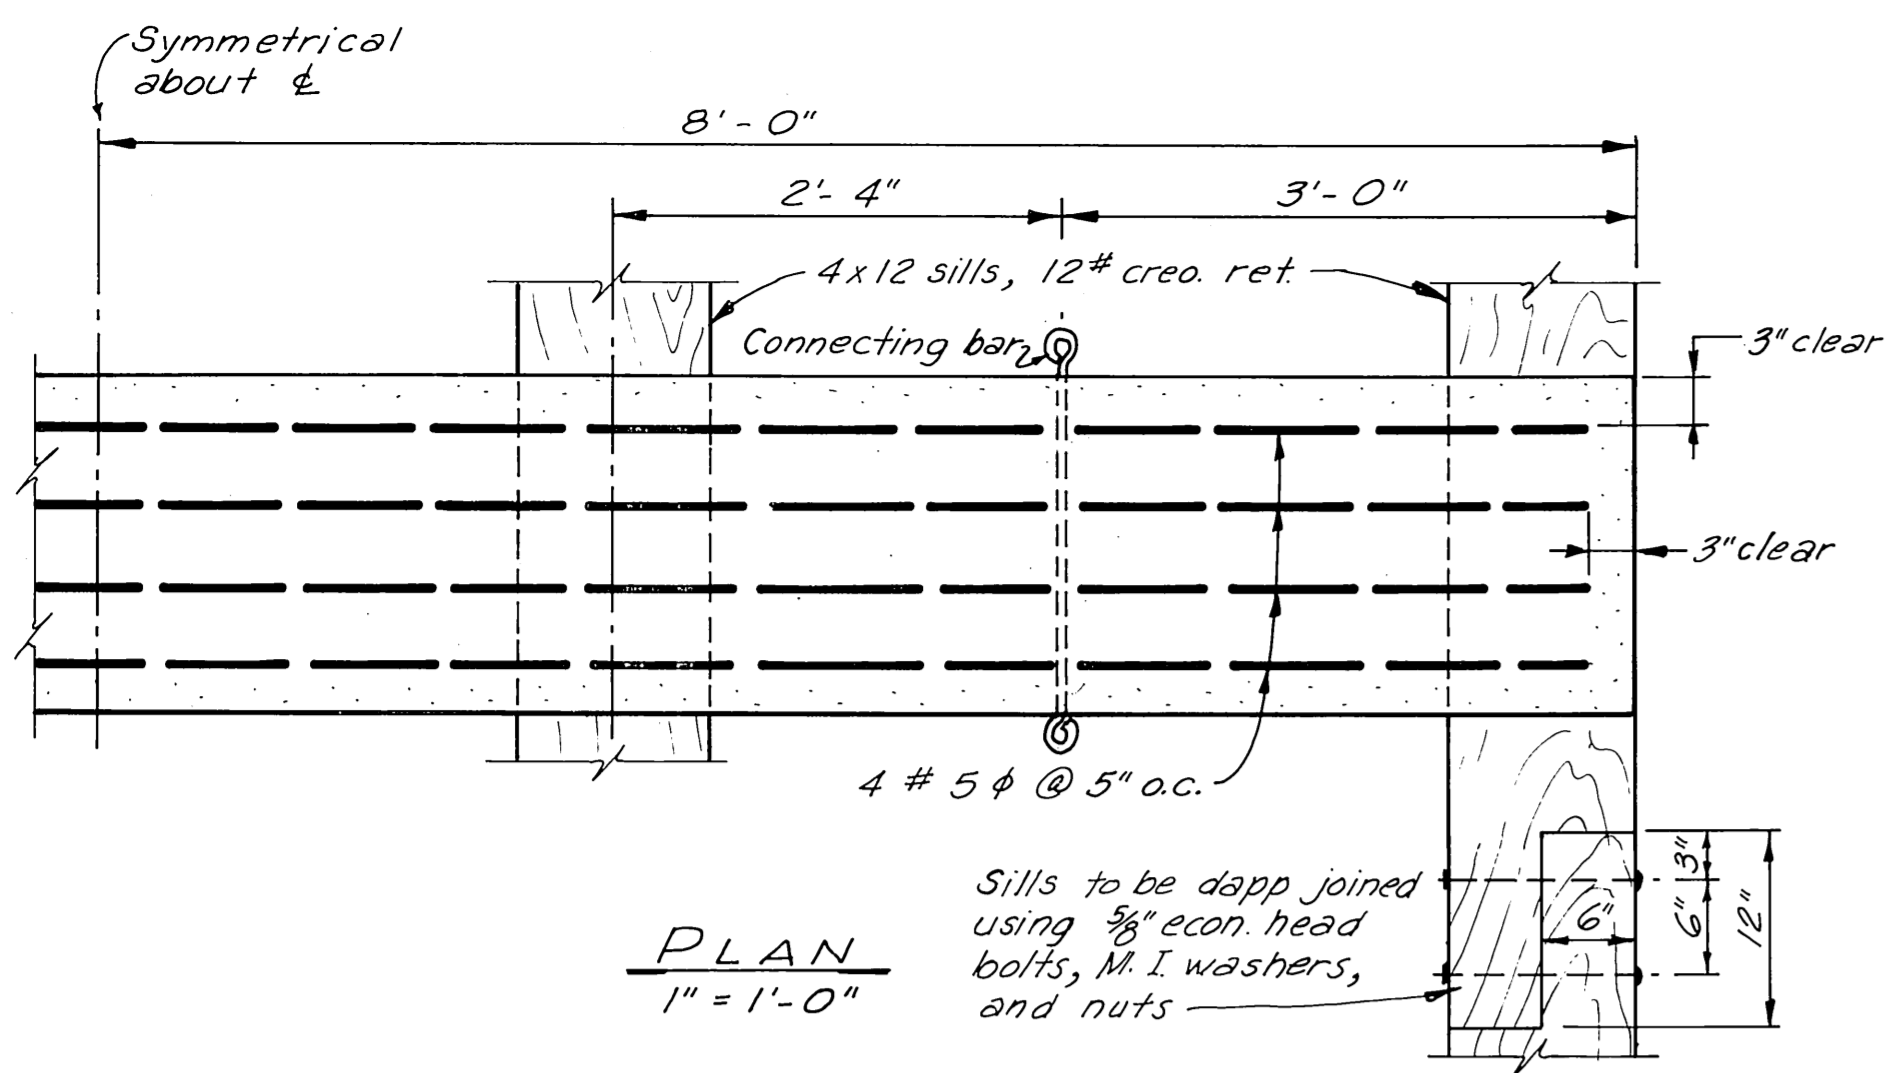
DETAILS - CONCRETE LAUNCHING RAMP PLANKS
